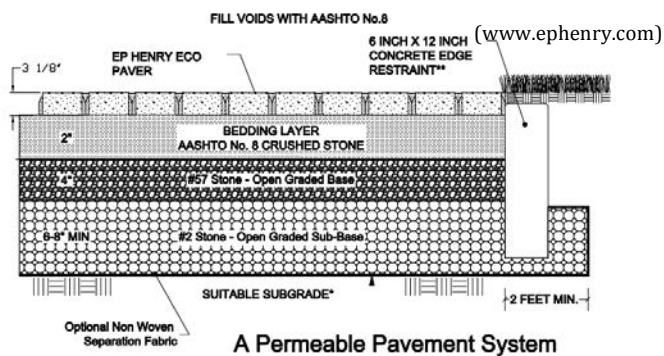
“Permeable Pavement Detail” by EP Henry
